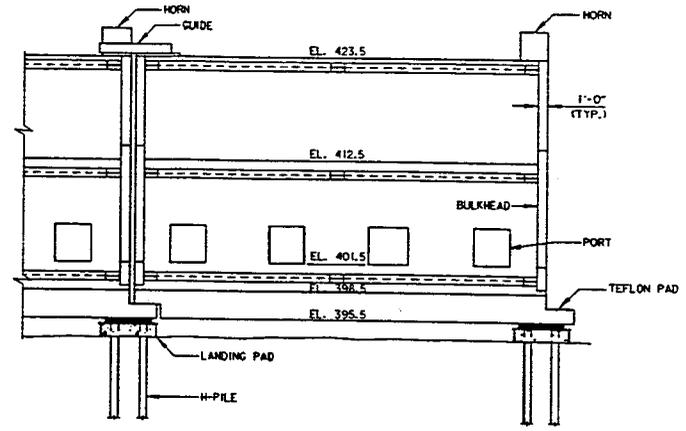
DETAIL I LOCK WALL/FLOOR CONNECTION SCALE: 1/4"=1'-0"
